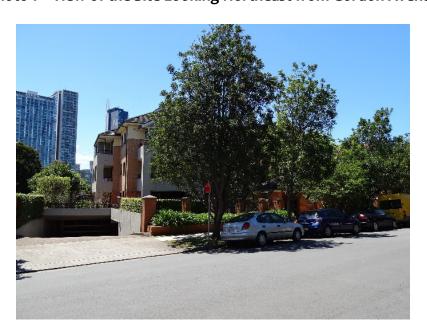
View of the Site Looking Northeast from Gordon Avenue
